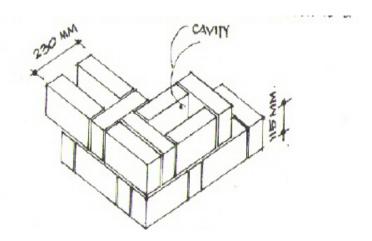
Typical Arrangement of bricks in a Rat-Trap Bond wall corner
